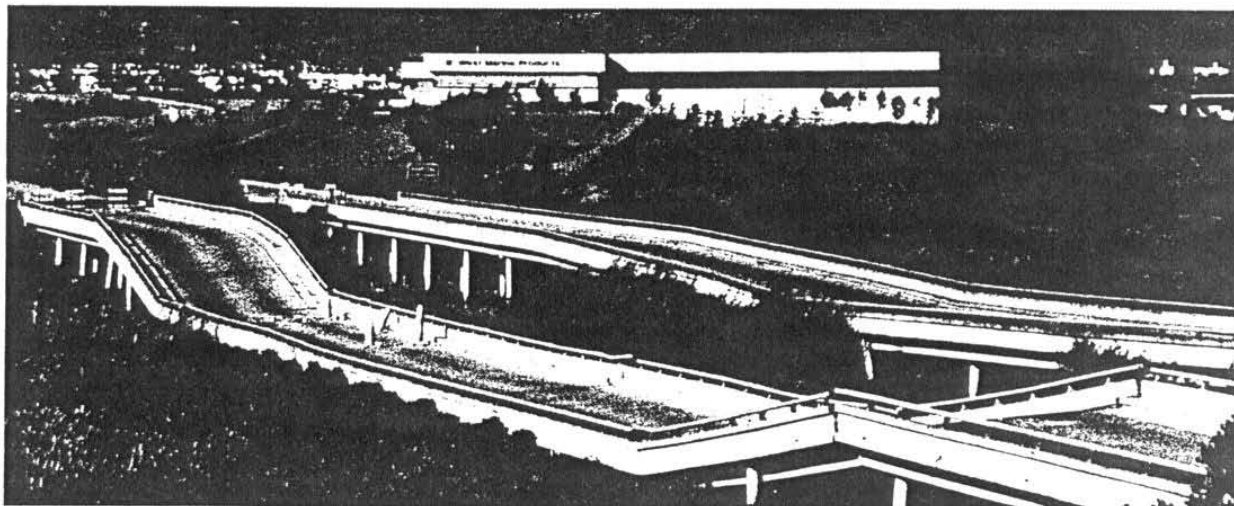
Ground failure occurred at this highway, overstressing column/slab connections.
